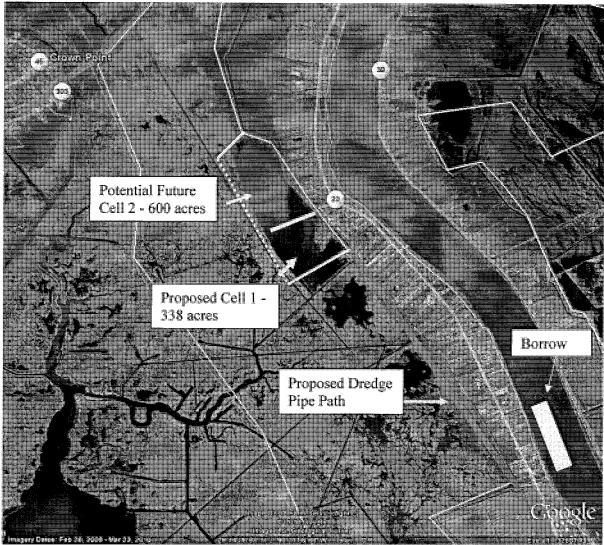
Proposed Jesuit Bend Mitigation Bank General Dredging Plan Layout.
